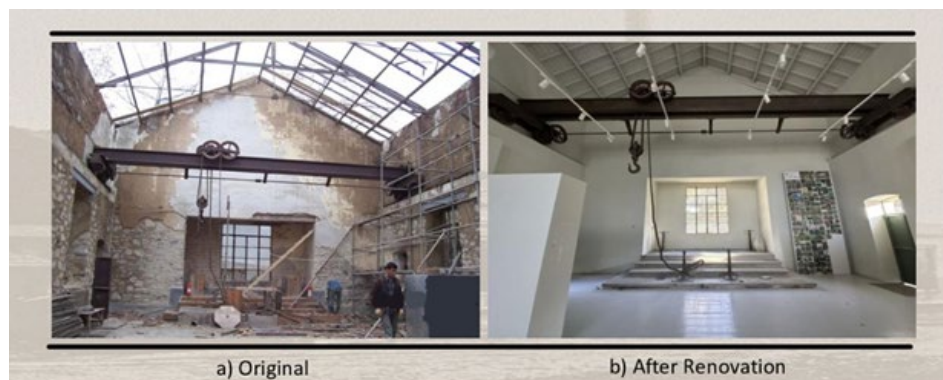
Cendere Art Museum structural systems (Rena Construction, 2006. Photographed by authors)
